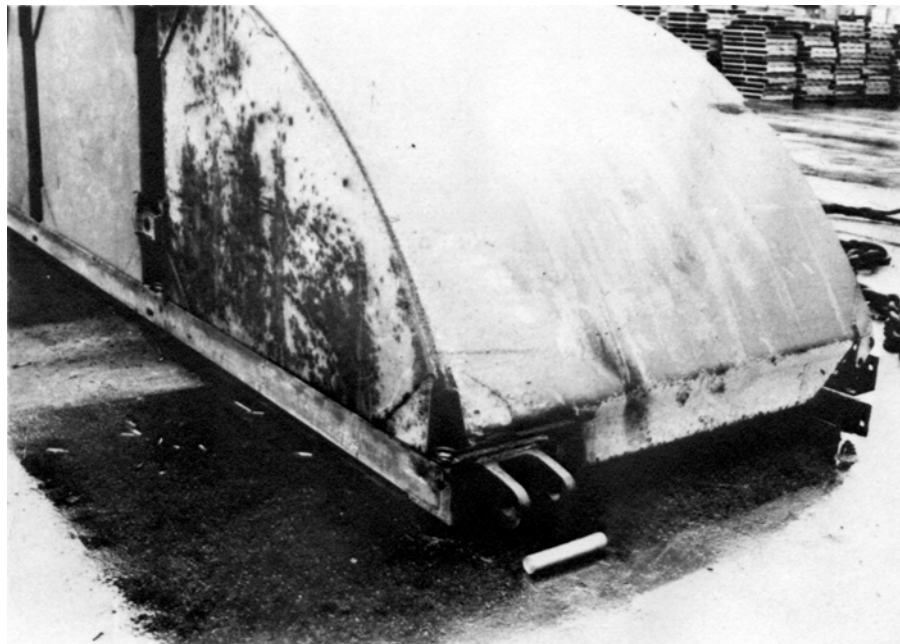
Pin type pad eye, for securing fixed end of flat wire rope connection, welded to bilge angle on inverted T-7 pontoon end of inshore causeway section.
